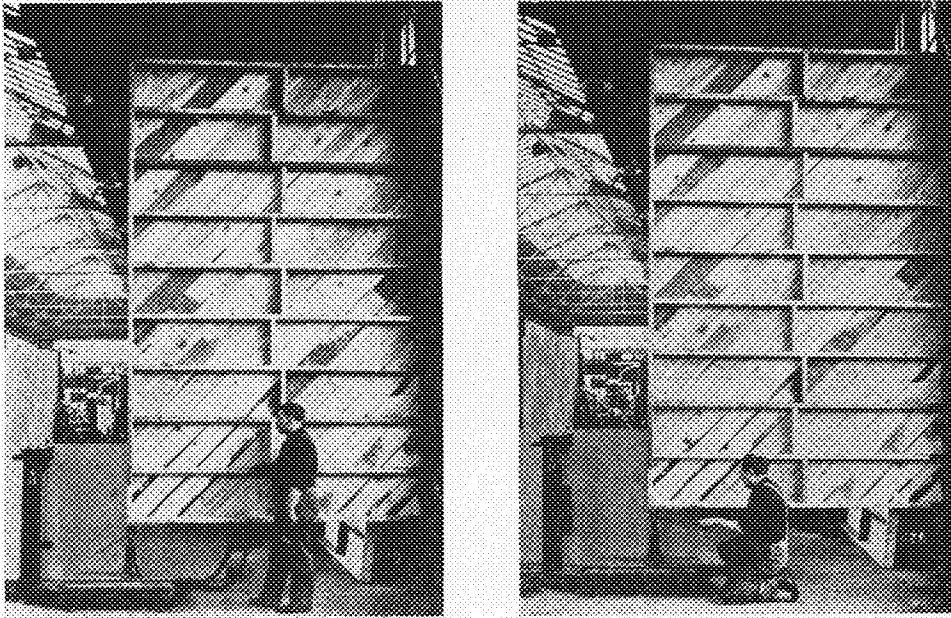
Frame Construction of the Walls; Diagonal Sheathing
